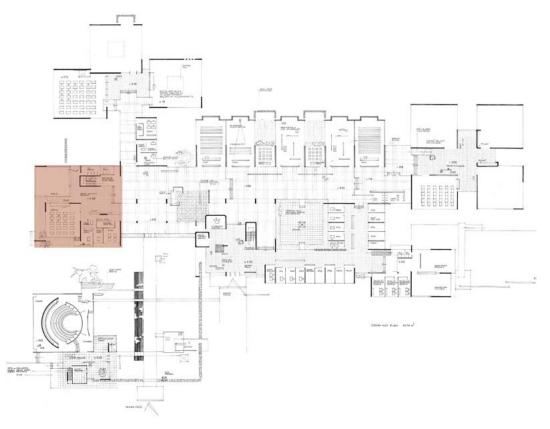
Altuğ, Behruz Çinici, Competition Entry, Ground Floor Plan, 1961.
